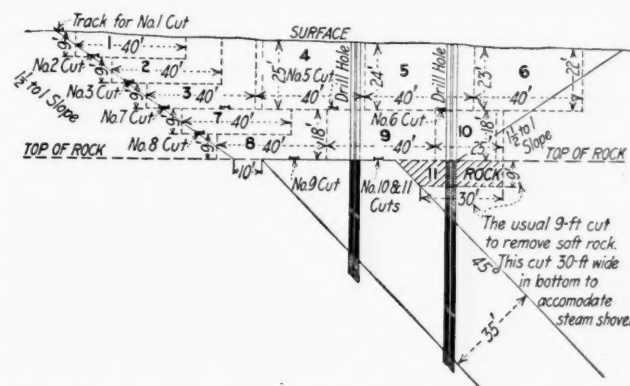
SHOWING REMOVAL OF NECESSARY SURFACE IN 11 CONSECUTIVE LIFTS
